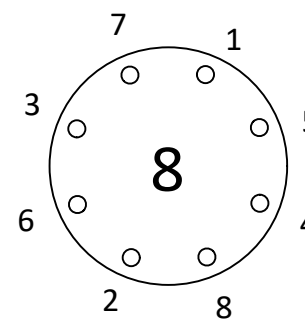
DETAIL - FLANGE ADAPTER AND BACK-UP RING
